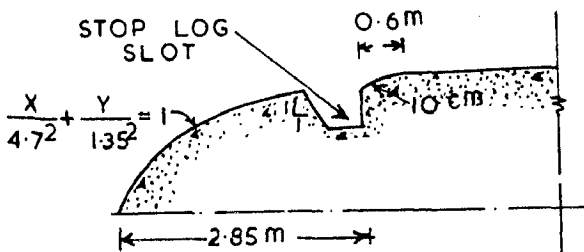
SPILLWAY PIER NOSE-CHIEF JOSEPH DAM
